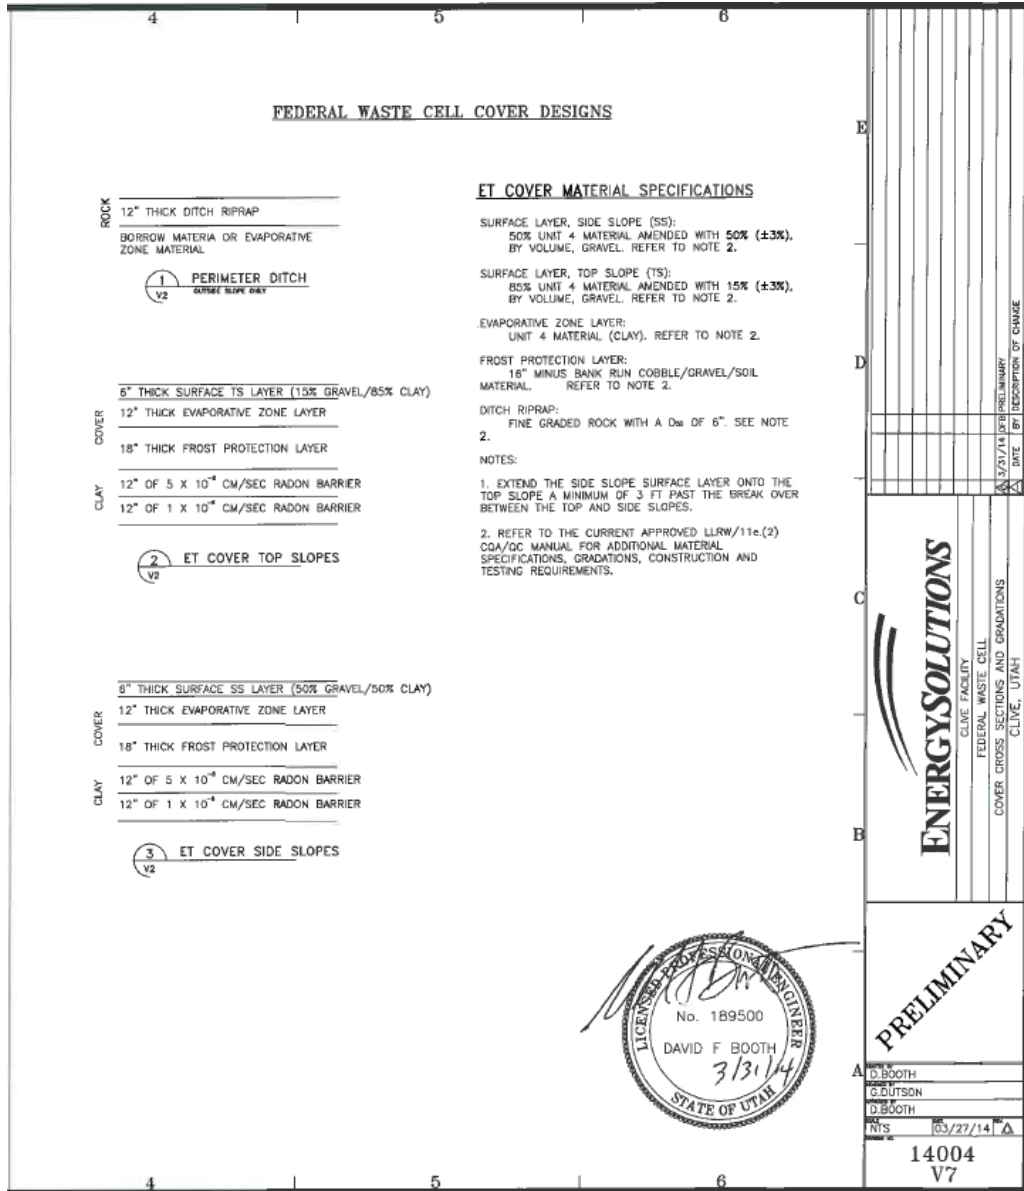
Federal DU Cell Class A South cell engineering drawing 07021-14004 V7: cap dimensions.
